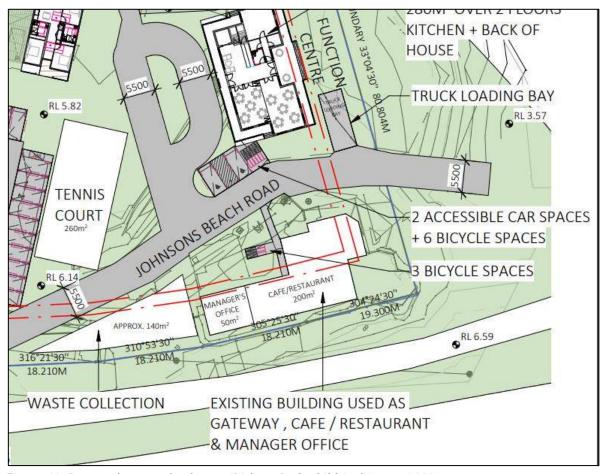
Proposed masterplan layout (Dickson Rothschild Architects, 2022).
